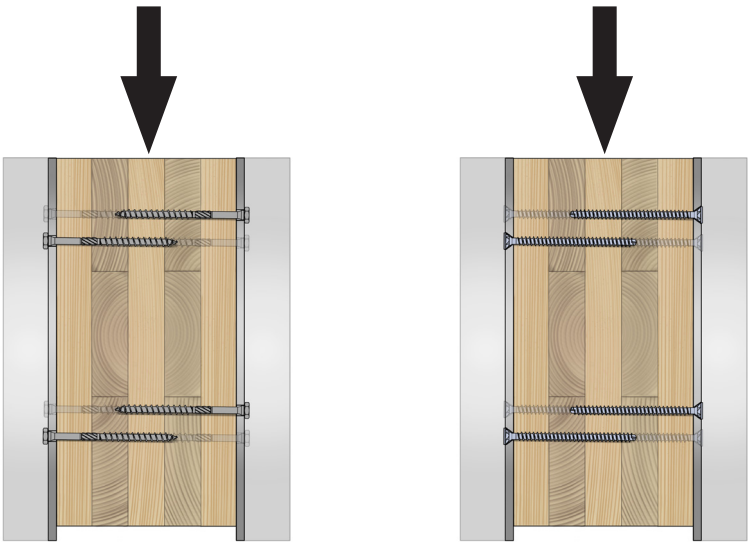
[left] Steel-CLT H-block test with 8 ASSY® Kombi screws; [right] Steel-CLT H-block test with 8 ASSY® VG CSK screws.
